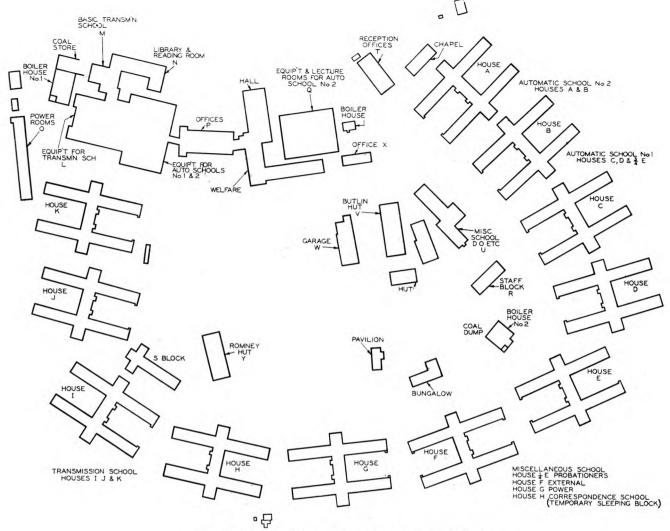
DUNCAN HALL—SITE PLAN AND GENERAL LAYOUT.
